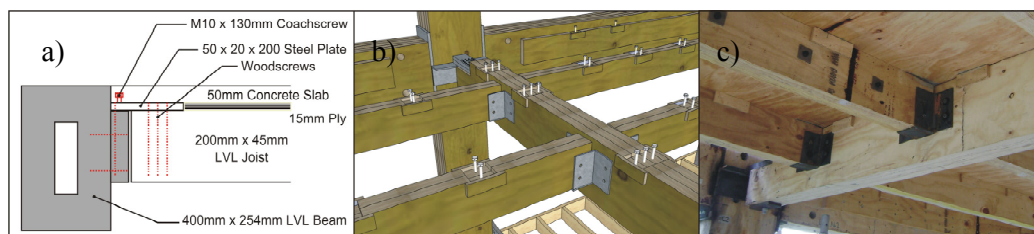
a) Top hung joist hanger (Newcombe et al. 2010b) b) and c) face mounted joist hanger
